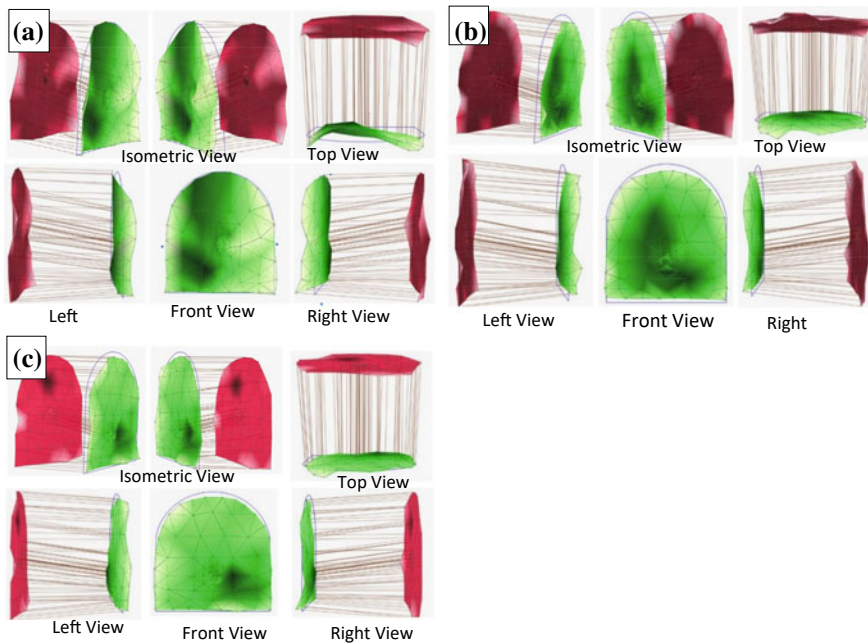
Three-dimensional images: cut 1, (a) chainage 11.5 m; (b) cut 2, chainage 16.1 m; c cut 3, chainage 20.5 m. The green and red surfaces are the faces and bottom profile surfaces areas respectively
